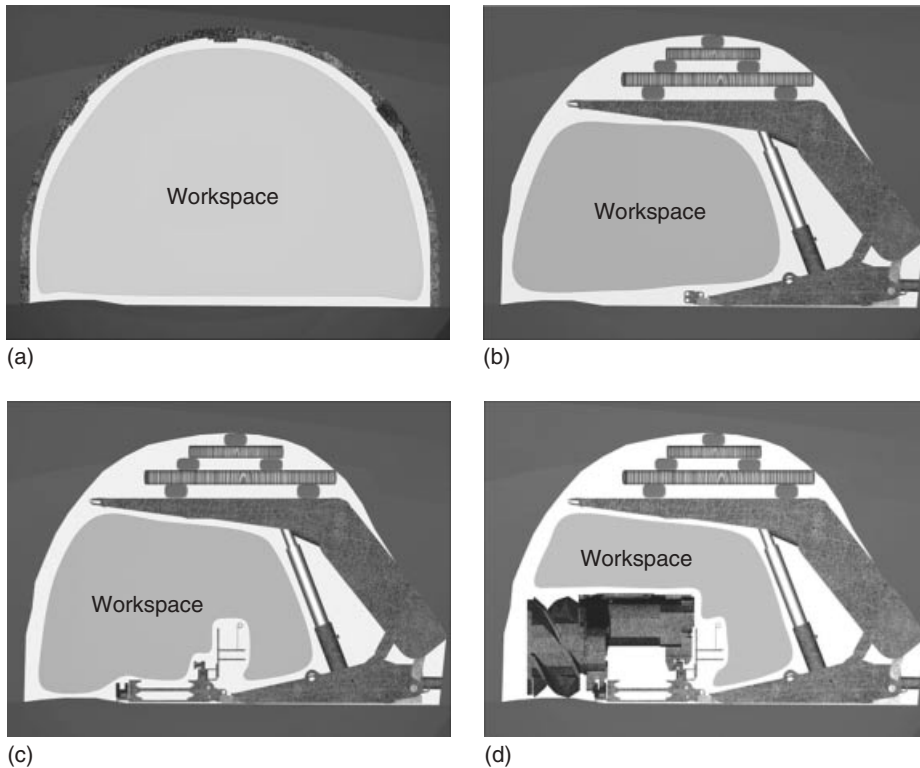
Installation of a longwall mining system: (a) initial roadway; (b) workspace after installation of a hydraulic roof support; (c) workspace after installation of a face conveyor; (d) workspace after installation of a longwall shearer.
